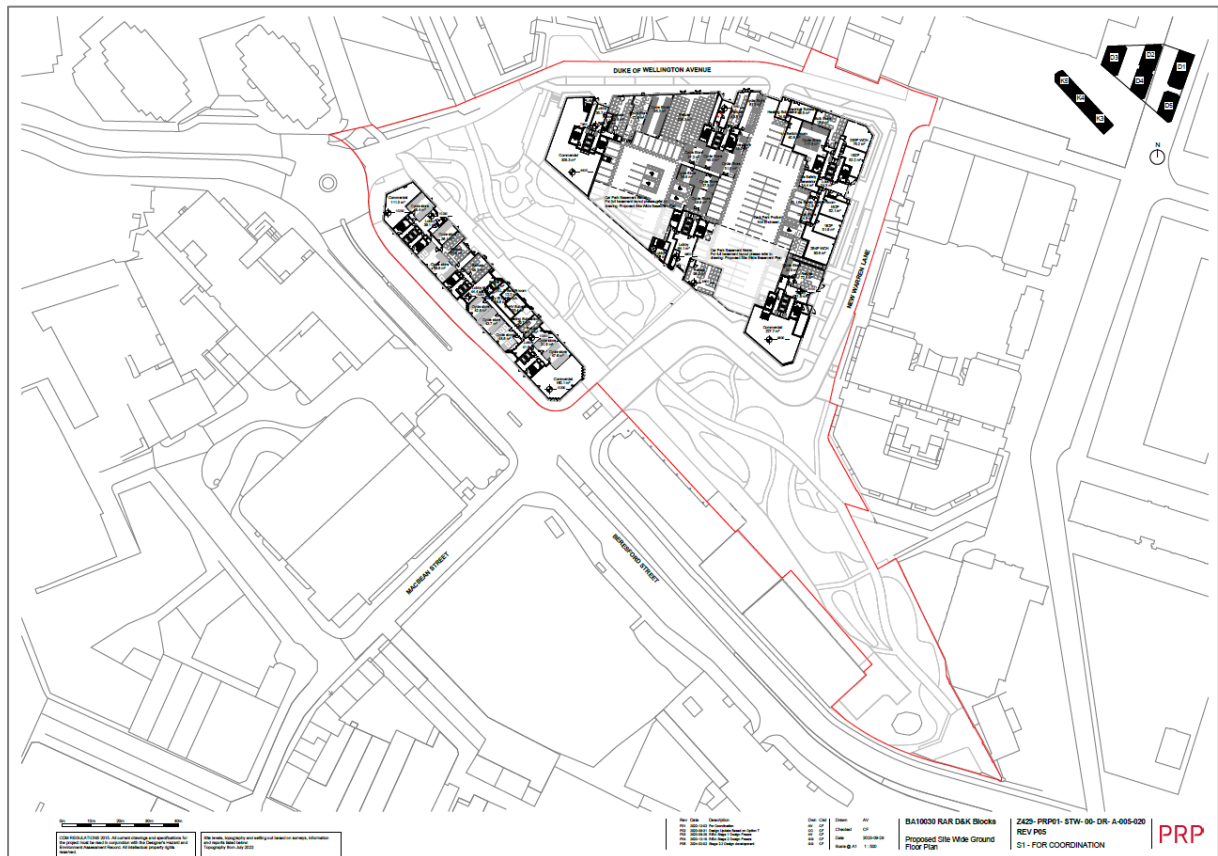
Proposed Ground Floor Layout – PRP Architects (February 2024)
